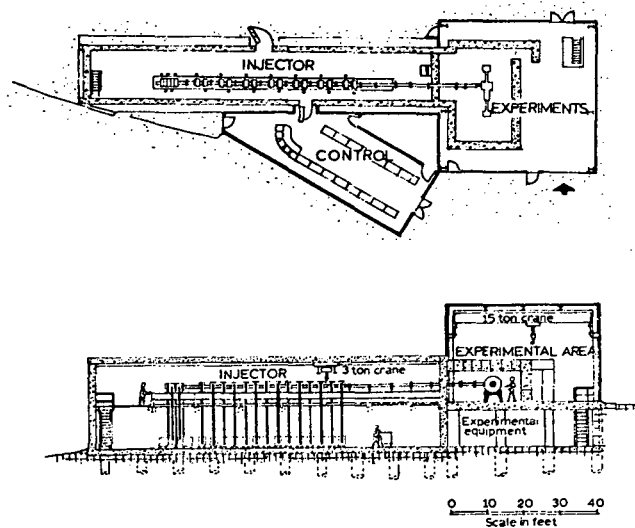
Accelerator Development Facility, Plan and Elevation.
